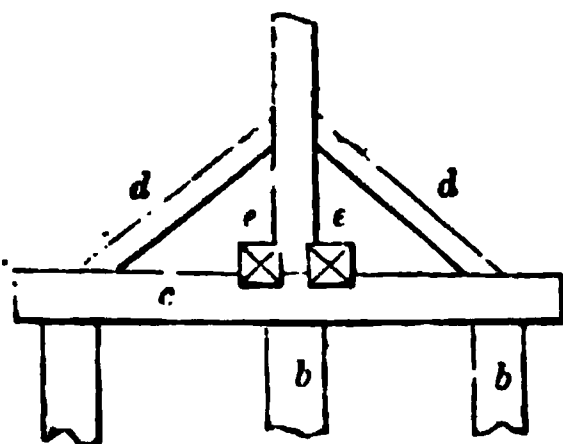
Elevation of the arrangement of a wide foundation for a wooden pier.
